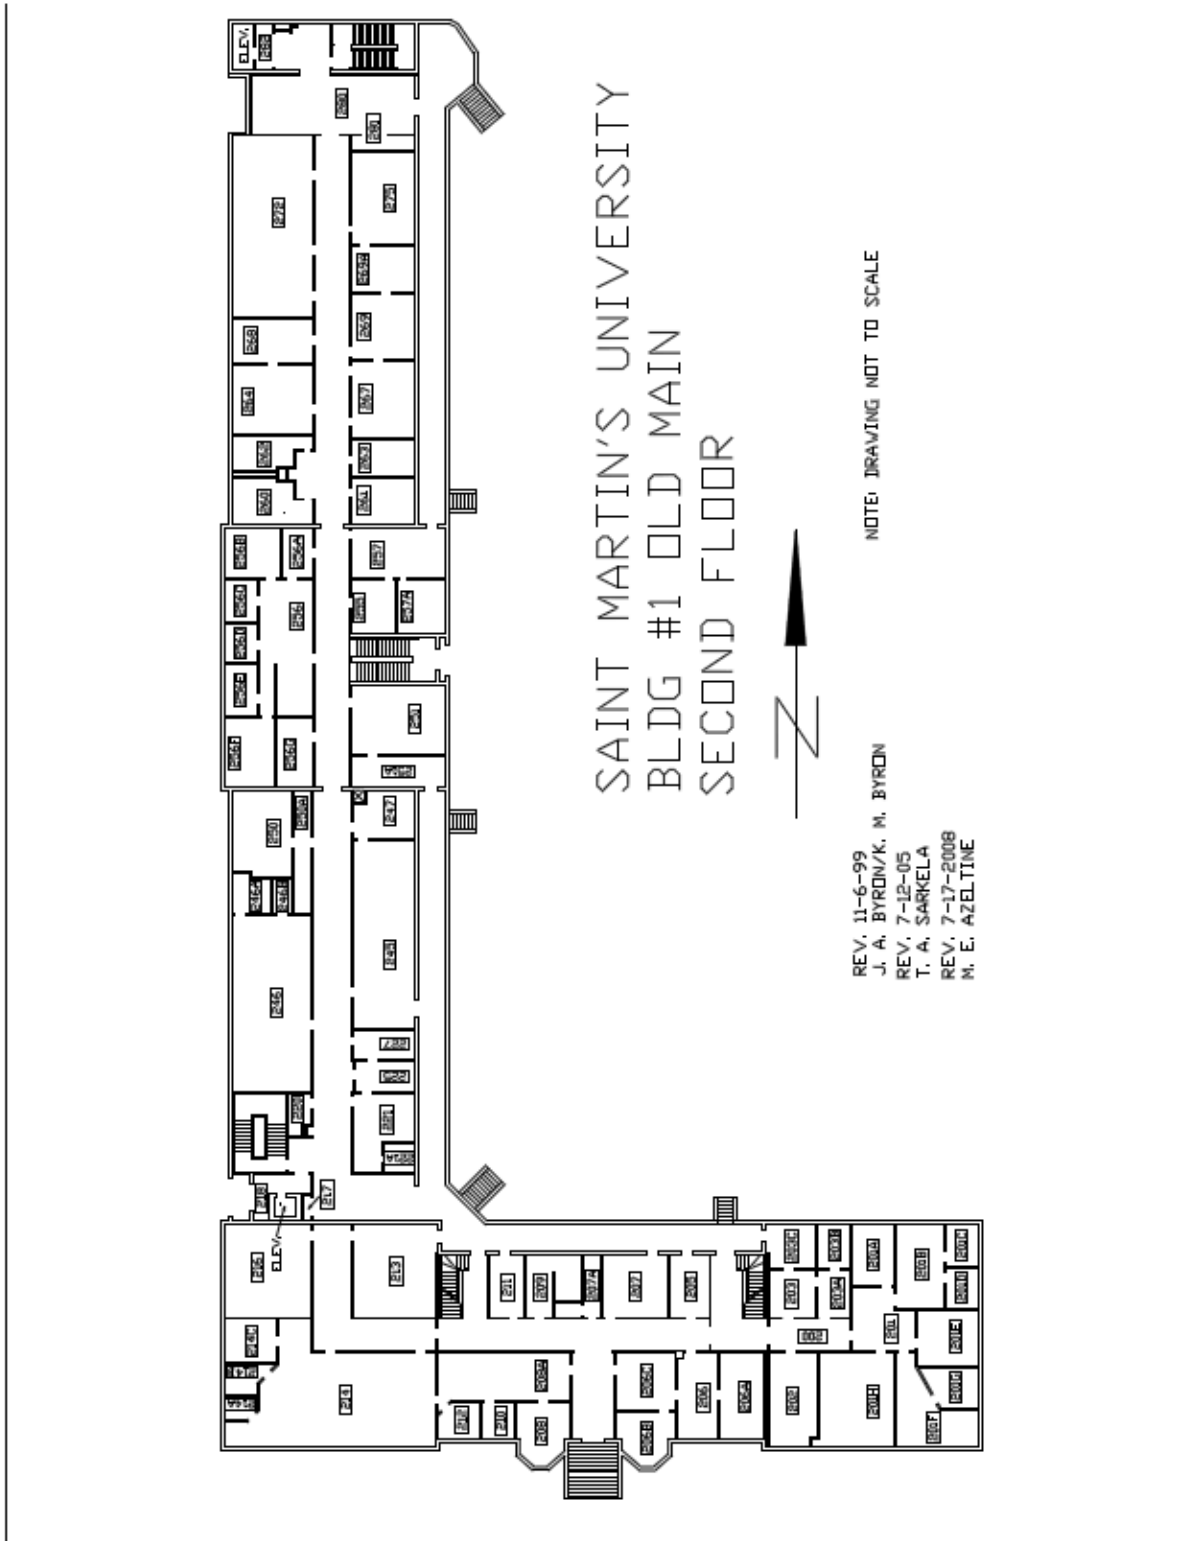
Saint Martin's College – Floor Plan – 2nd floor
